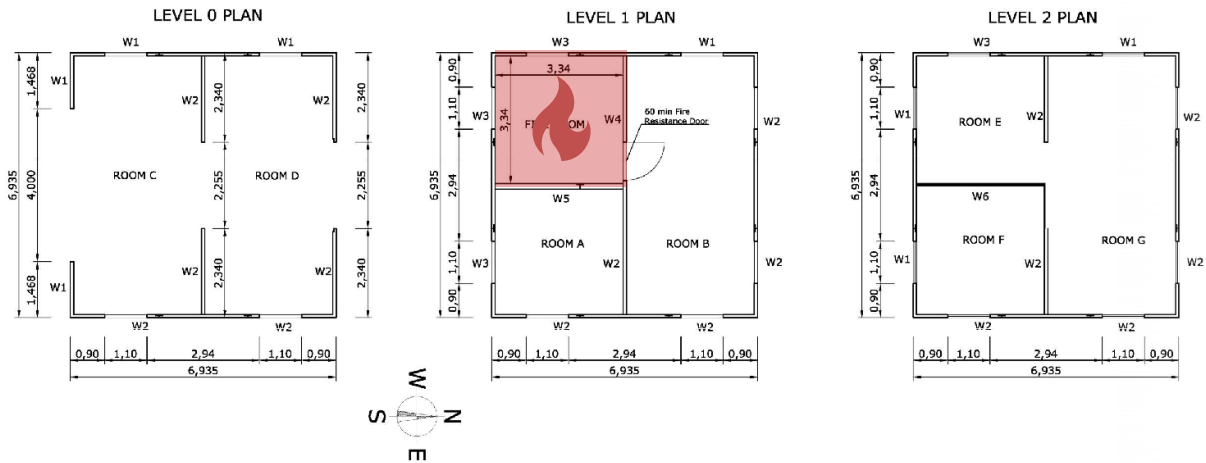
Plans of 3-storey timber building for the natural full-scale fire test [42]
